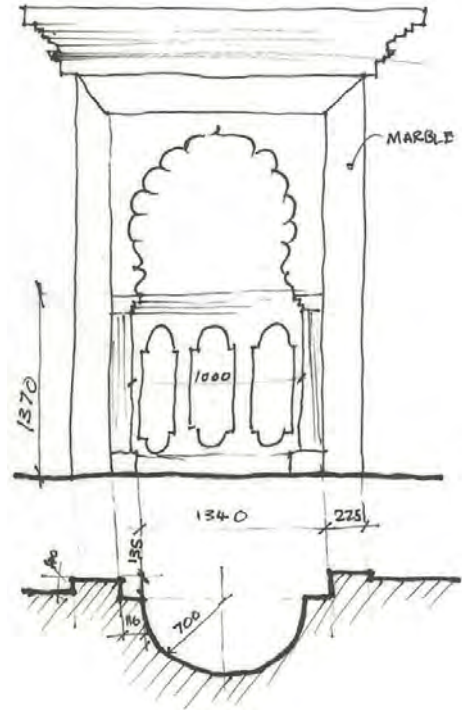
, Plan and elevation of the mihrab (Author, 2011)
